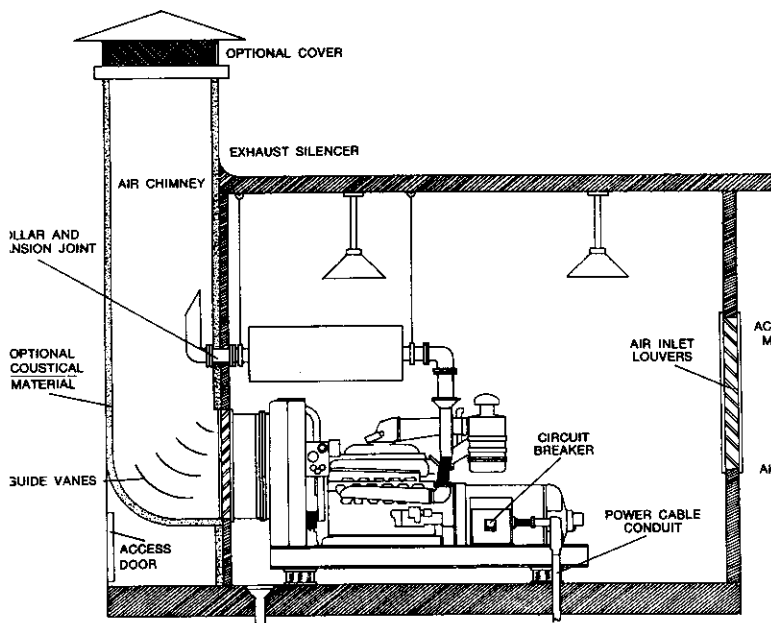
HORIZONTALLY MOUNTED EXHAUST SILENCER WITH EXHAUST AND RADIATOR AIR DISCHARGING INTO COMMON STACK
